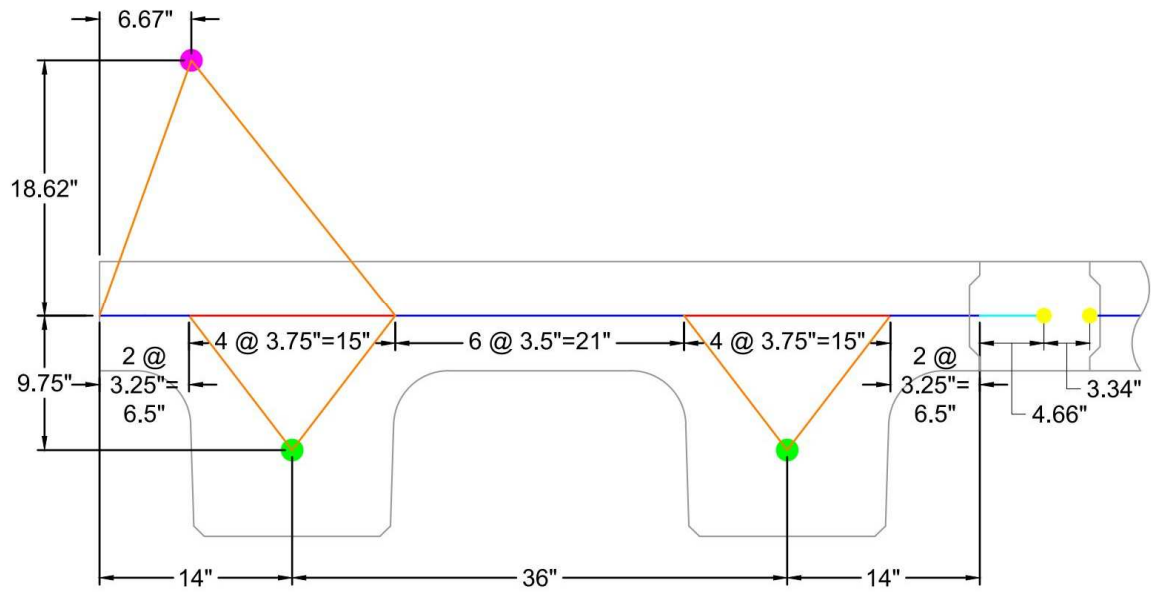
Shell modeling layout for six-foot NEXT-D section
